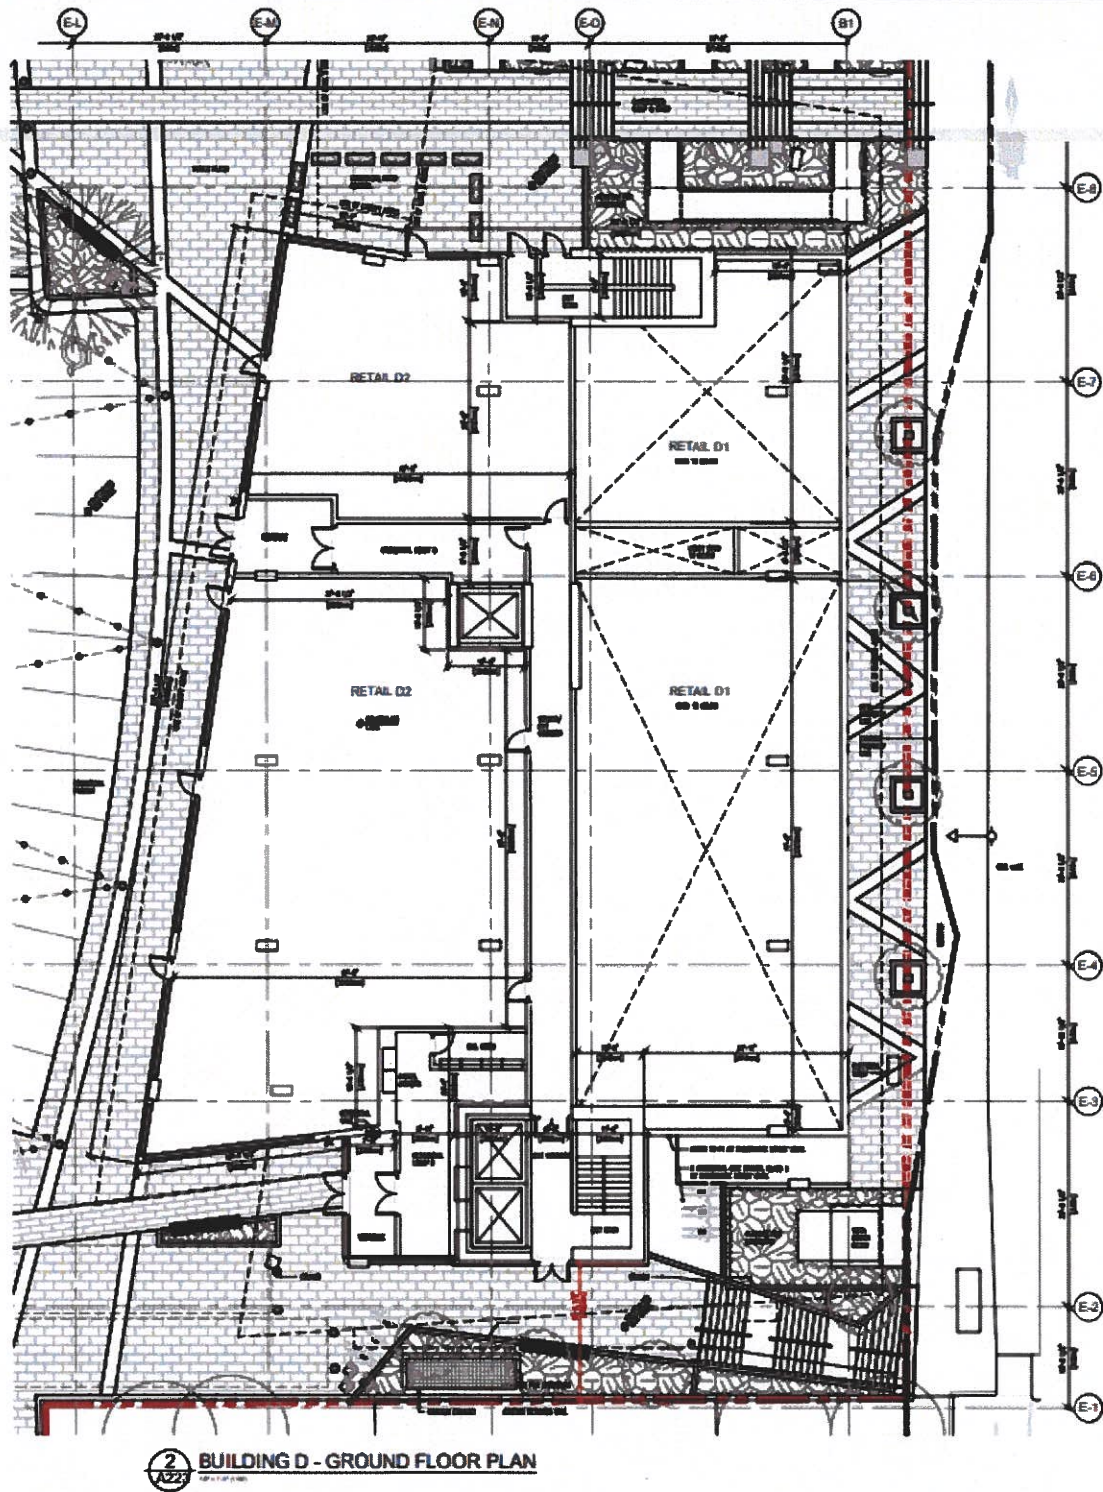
Proposed Building D's Ground Floor Plan (provided by WA architecture)
